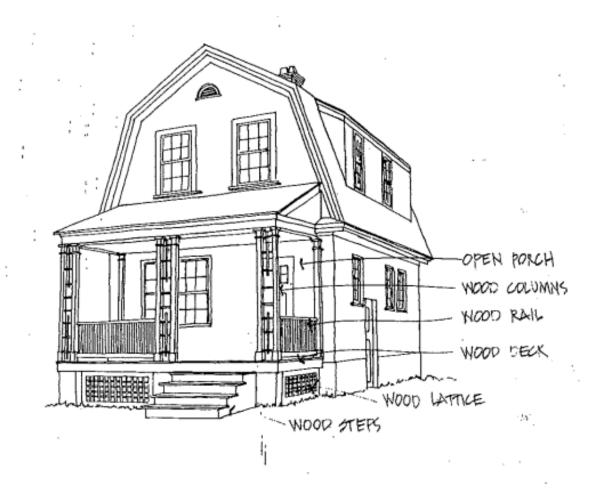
Example of Modern Housing dwelling as historically constructed in the district with structural attributes.
